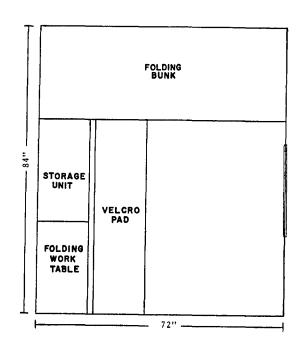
PLAN VIEW OF GENERAL & HOUSEKEEPING MOCKUP
